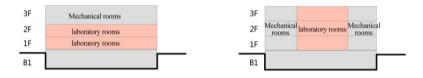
Two machine room layout diagram (left: different floor layout; Right: same floor layout).
